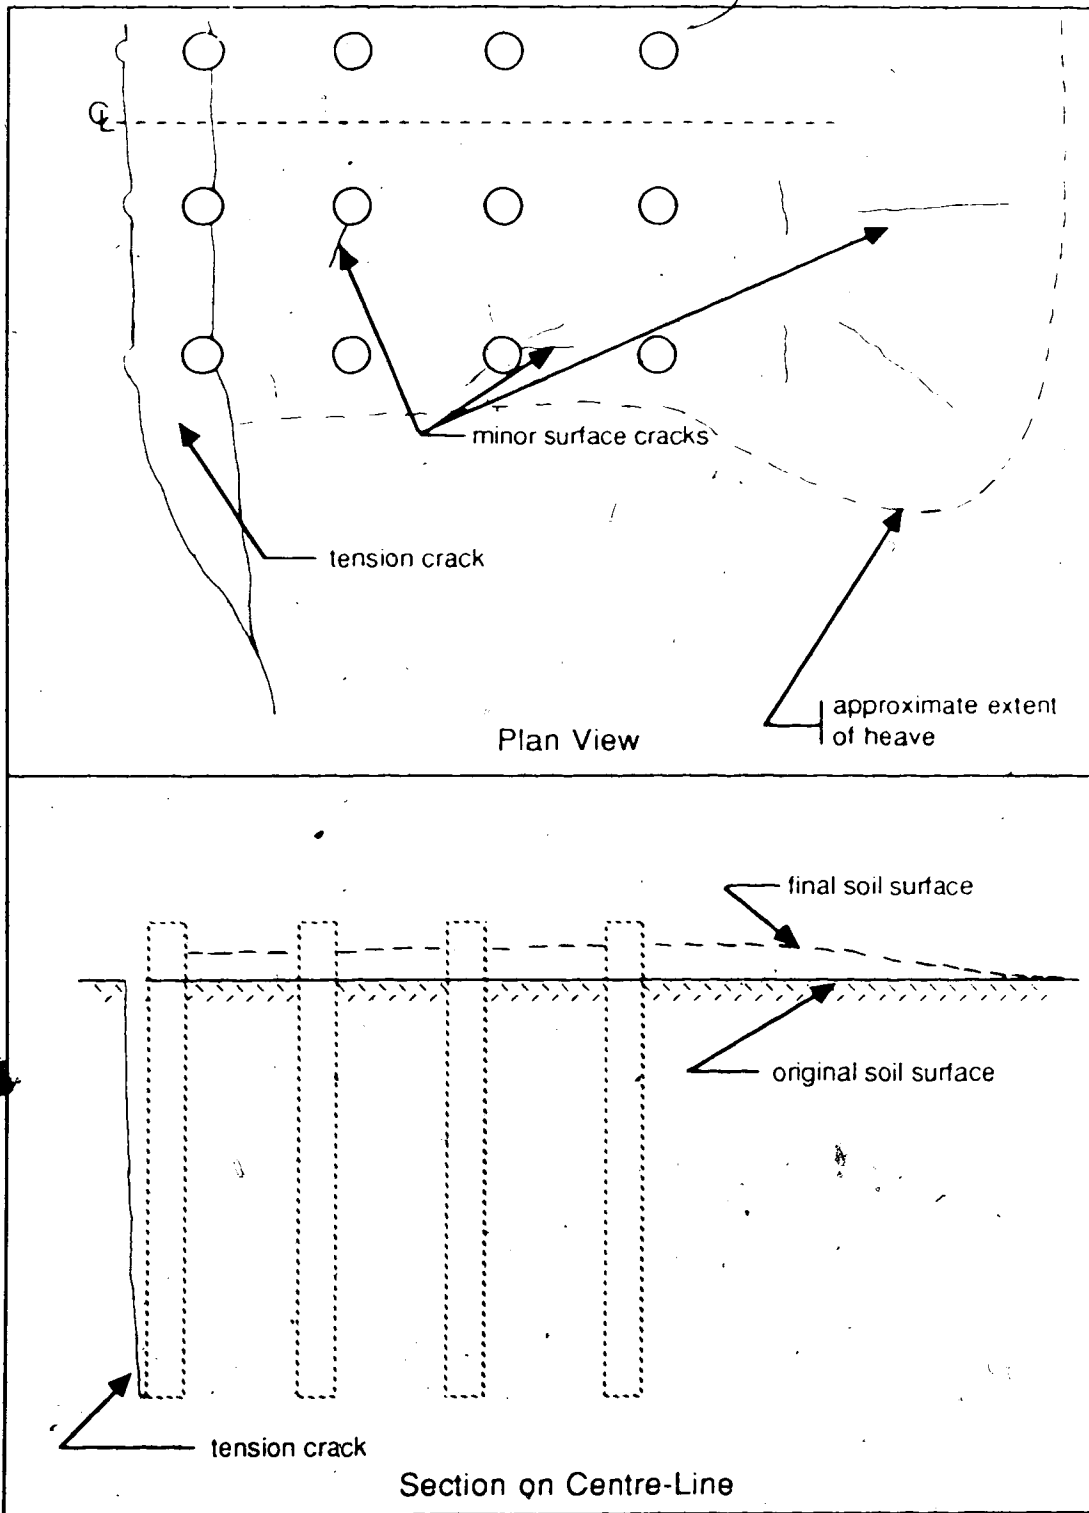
SKETCH OF THE SOIL DEFORMATION PATTERN AROUND A 4x4 PILE GROUP
